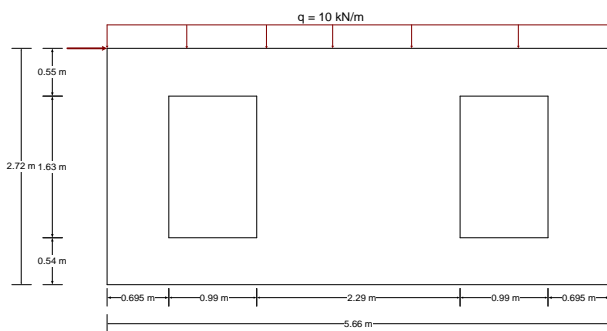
Wall 8: Irregular wall with $i_s = 0.667$
